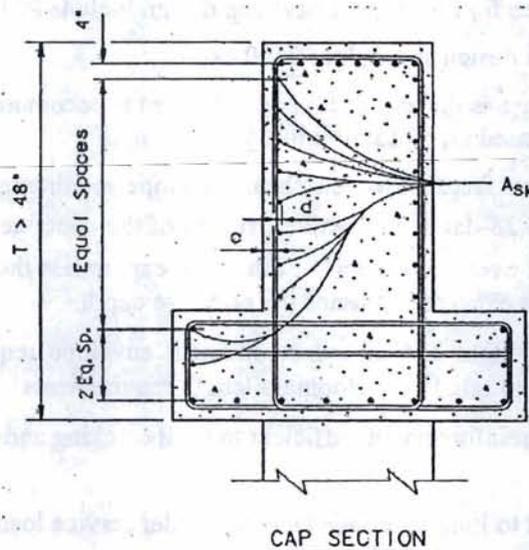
Typical Bent Cap Reinforcement—Inverted-tee Cross Section [6.1]
